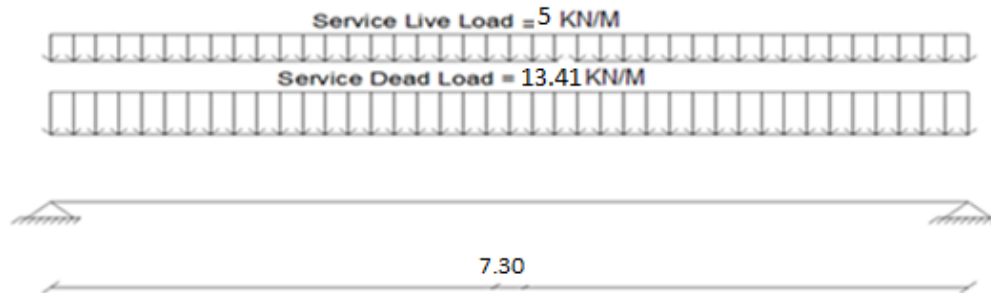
Statically System and Loads Distribution of Solid slab .
